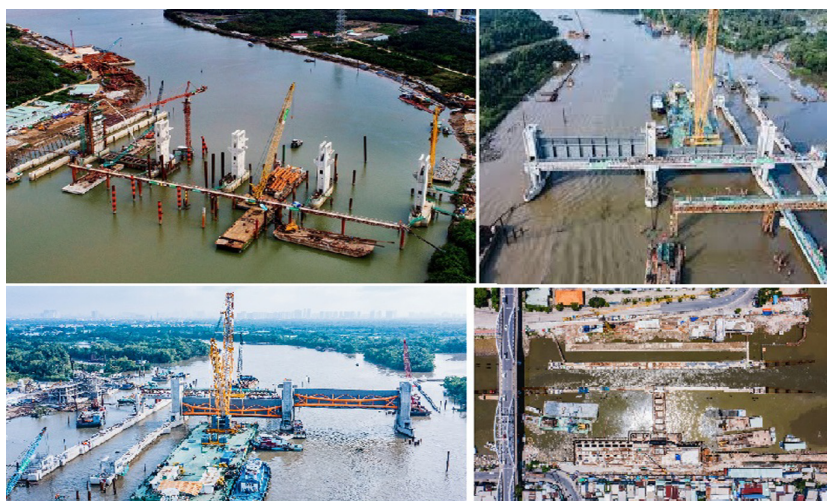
The actual pictures of the flood protection system under construction in HCMC
